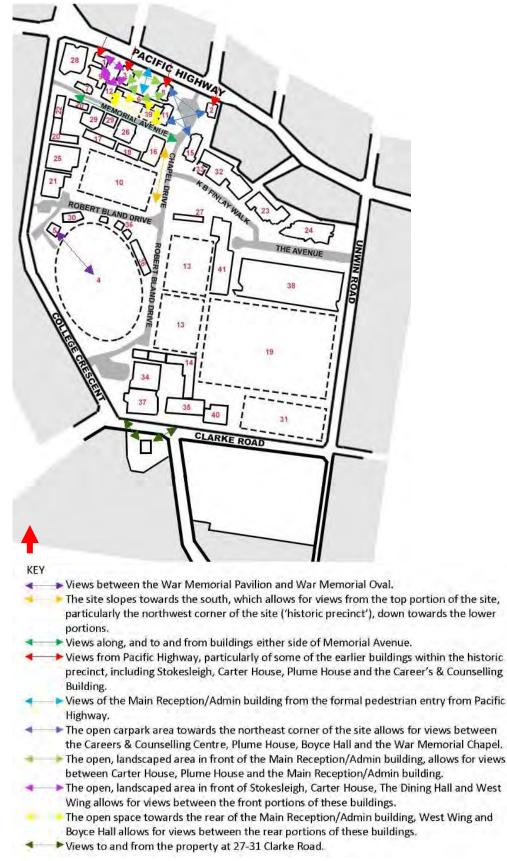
Site Plan, with view lines and view corridors indicated by arrows. (Source: NBRS, 2022)
